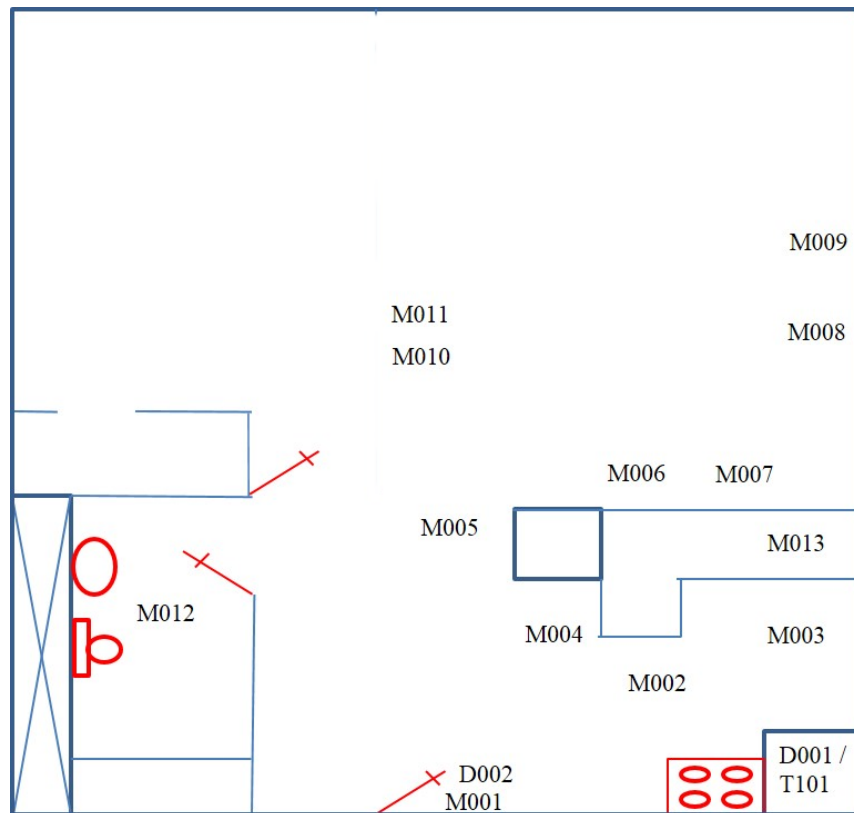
Floor plan and sensor placement for the testbed hh129.
